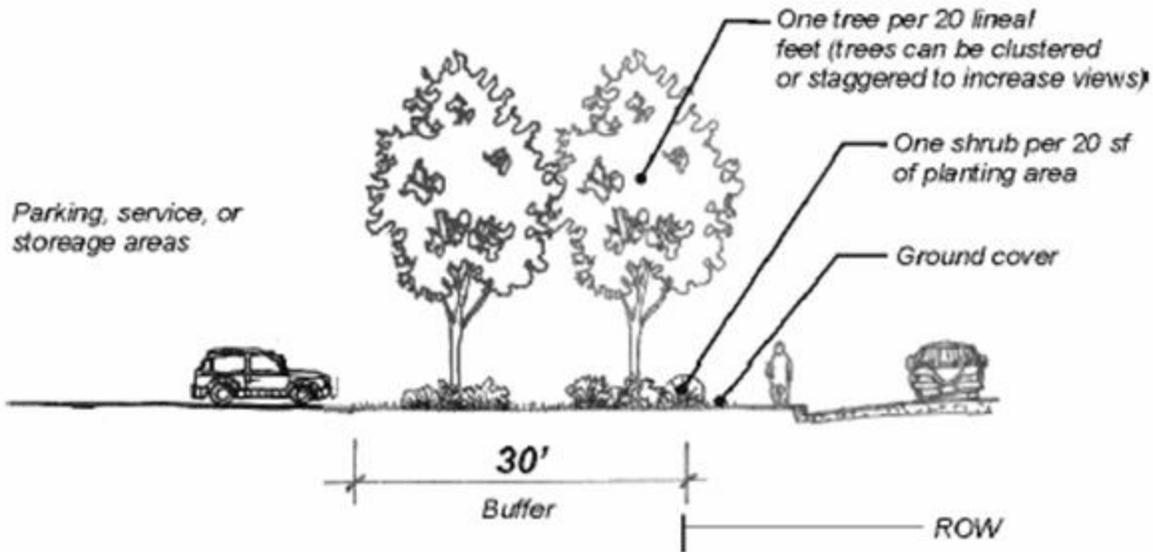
Illustrating standards for landscaping buffers between a street and parking lot.
